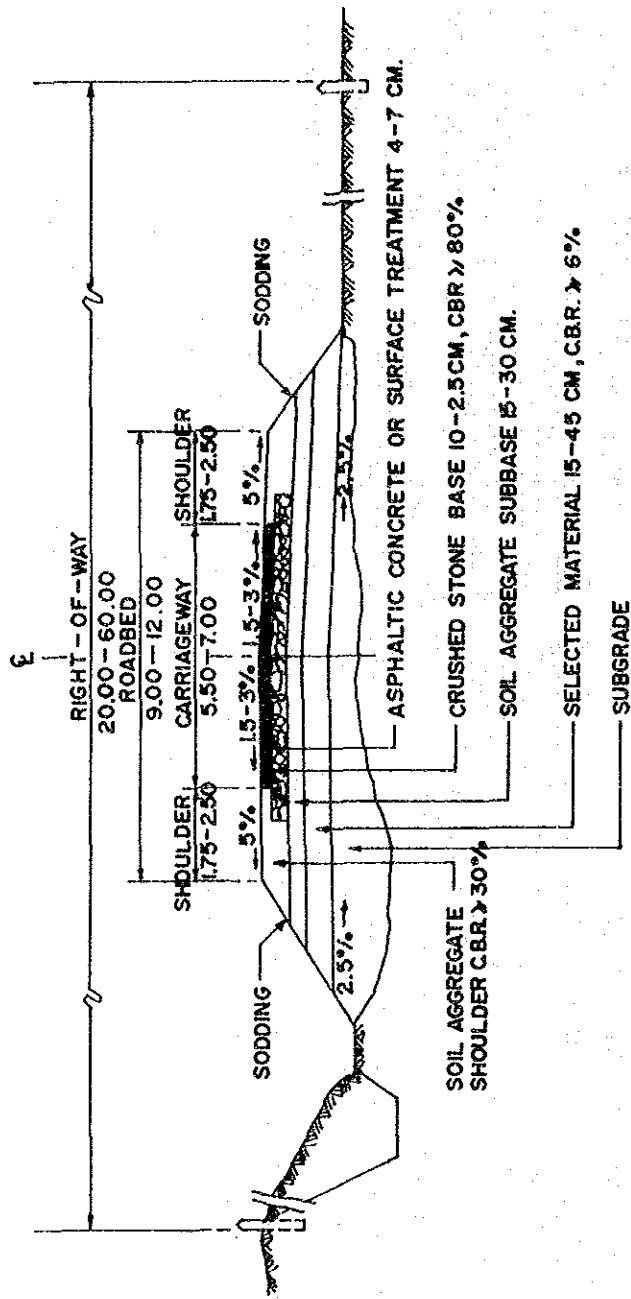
TYPICAL CROSS SECTION OF PROVINCIAL HIGHWAY (PAVED)
